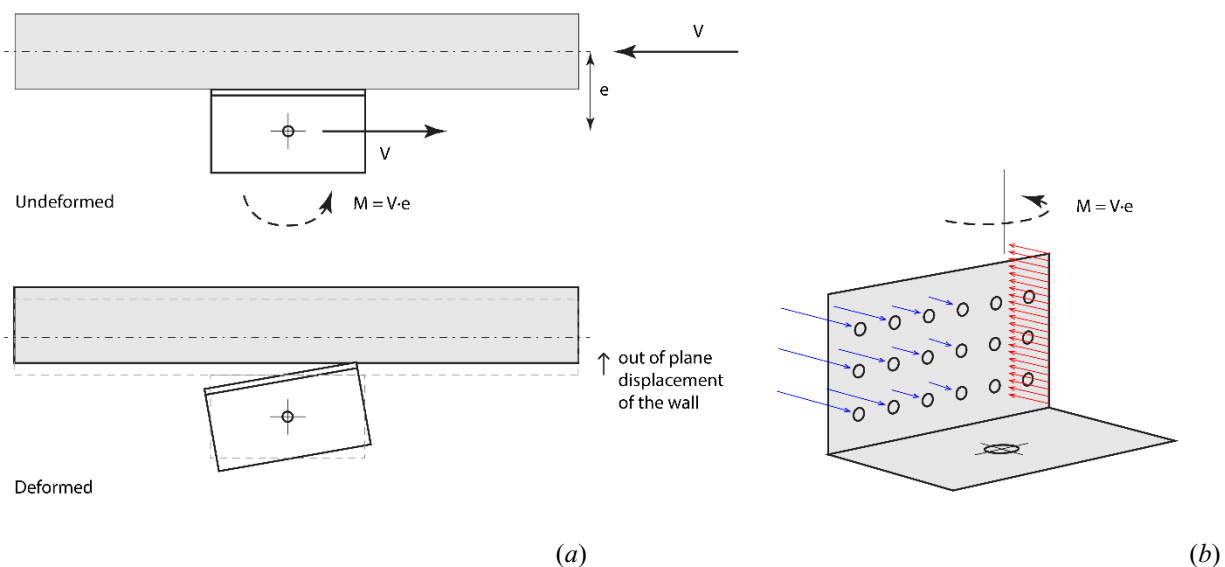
Out-of-plane behavior of angle brackets caused by secondary moment due to eccentricity between wall and connection: (a) undeformed and deformed configurations; (b) detail of forces on connections.
